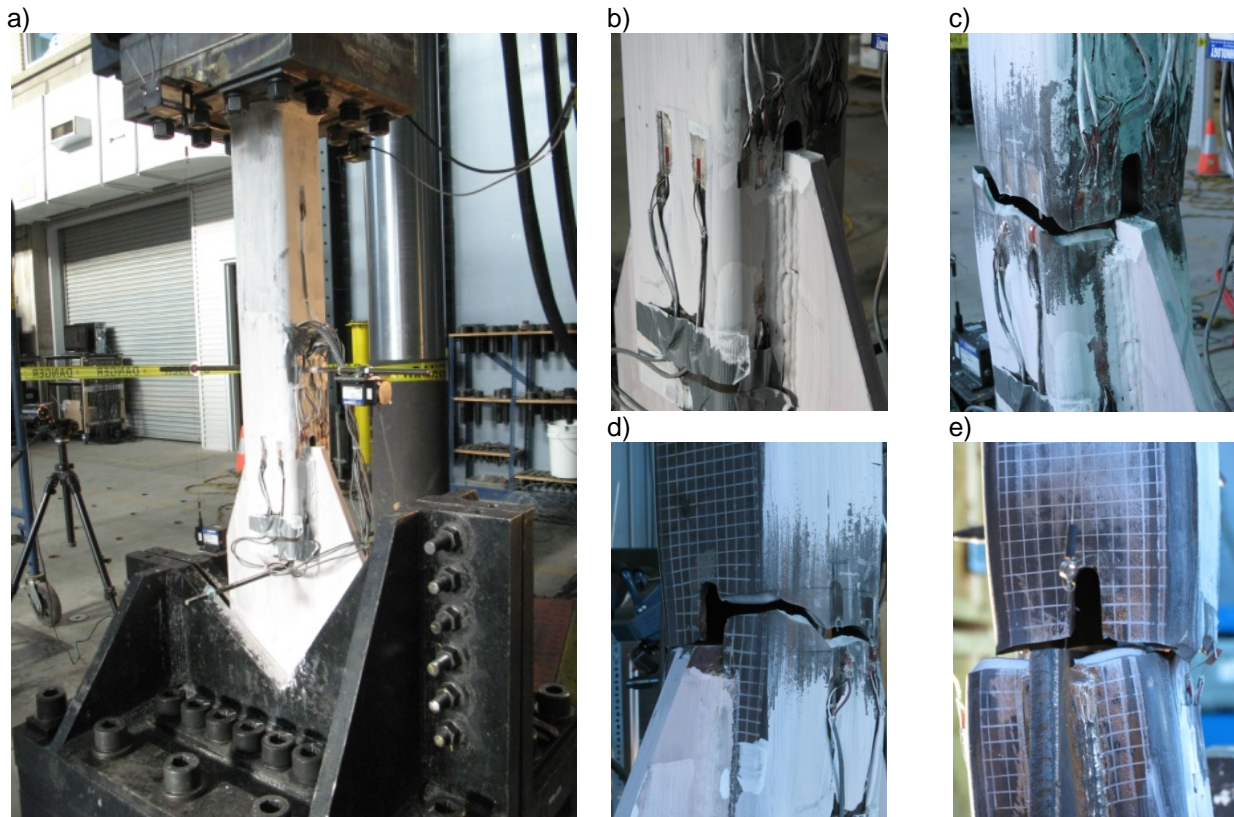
Typical brace specimen setup (a). Close-up views of the slotted tube-to-gusset plate connections showing net-section fracture for specimens 1 (b,c,d) and 2 (e)
